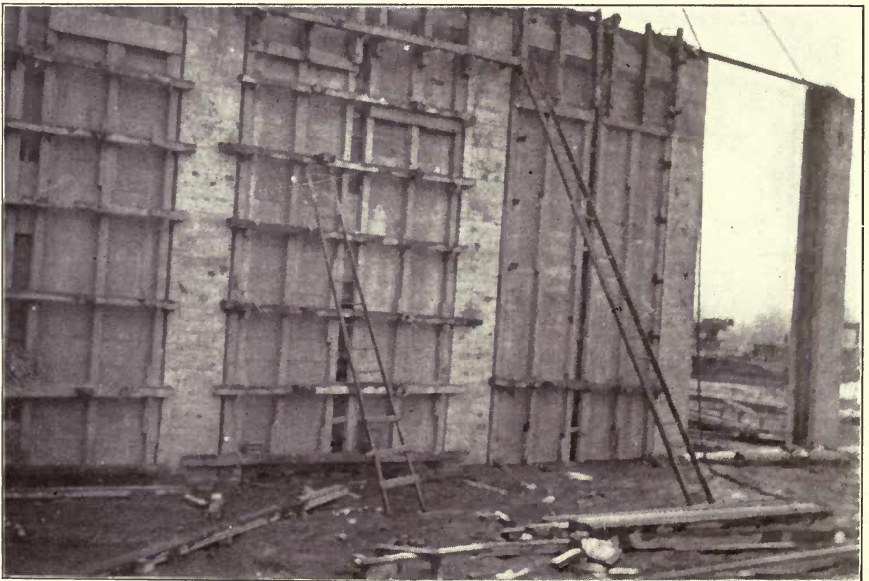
Panel Wall Forms for an Atlas Portland Cement Company Building. (*See p. 173.*)
